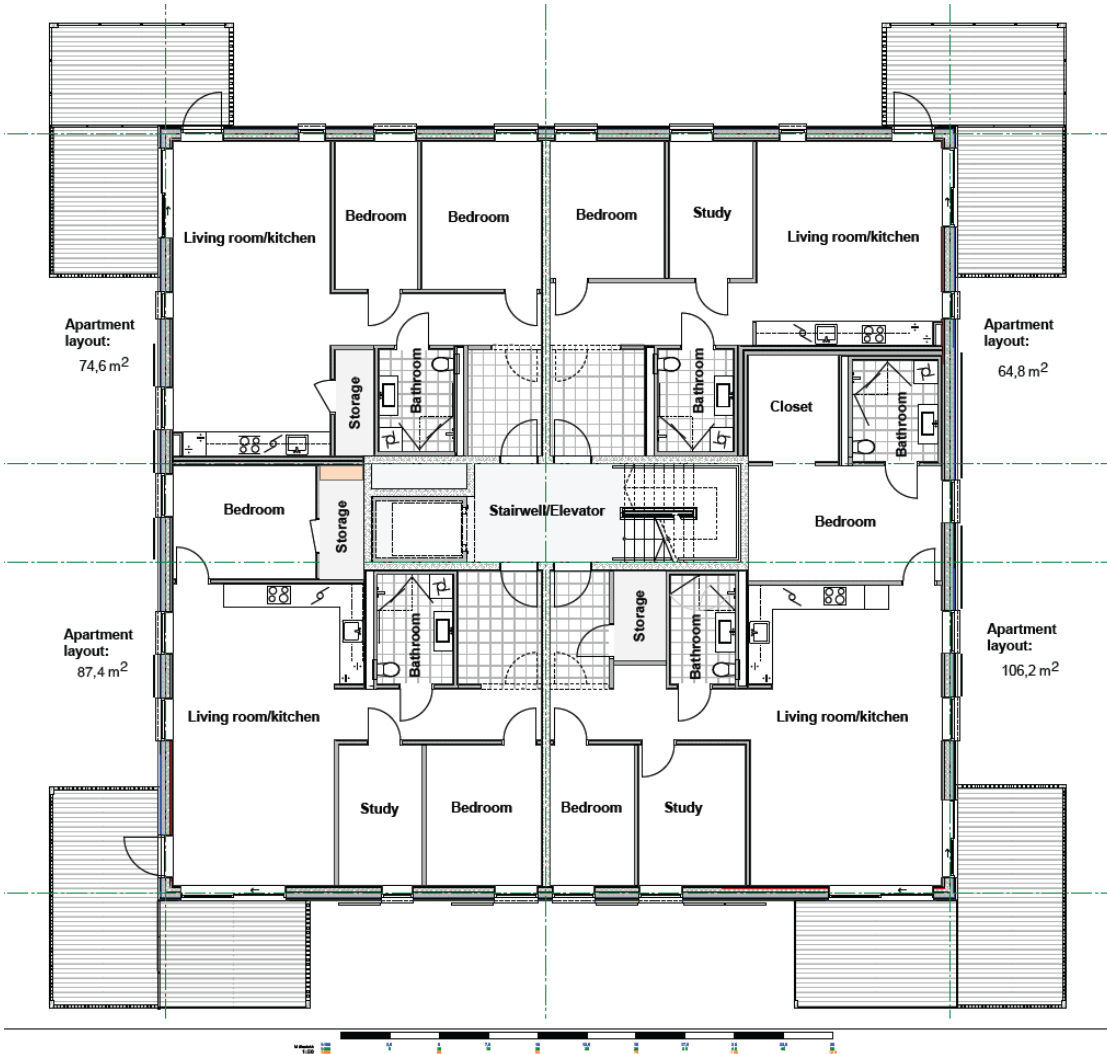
Typical floor plan with 4 different apartment layouts. 4th floor of Panorama – building K
